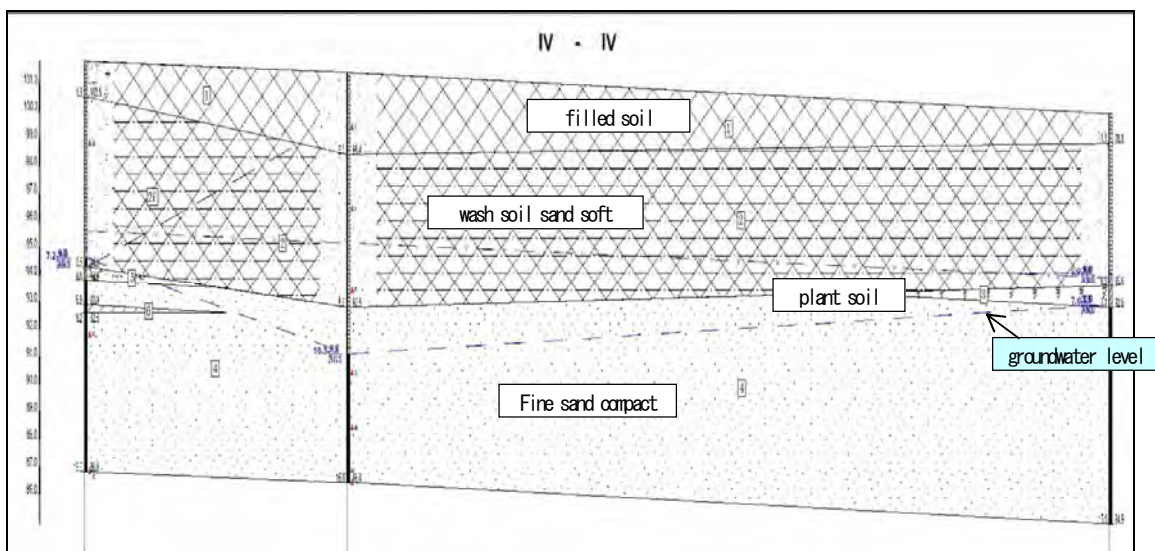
Section Plan IV-VI (Near Construction Site of New Facilities for Block 1)
